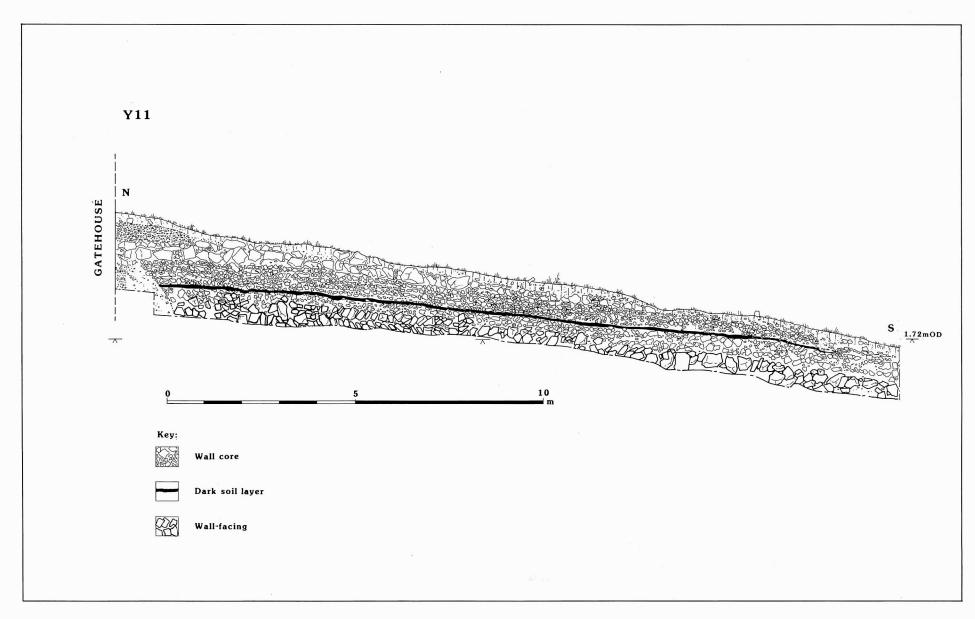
Elevation of the west face of the Lower Enclosure Wall (Y11)
